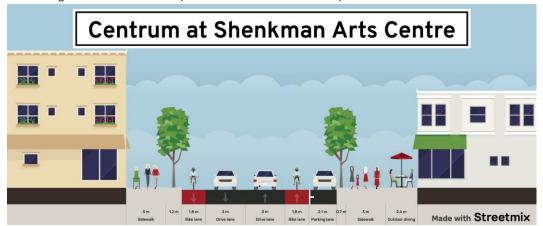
Streetscape cross-section of Centrum Blvd at Shenkman Arts Centre.
